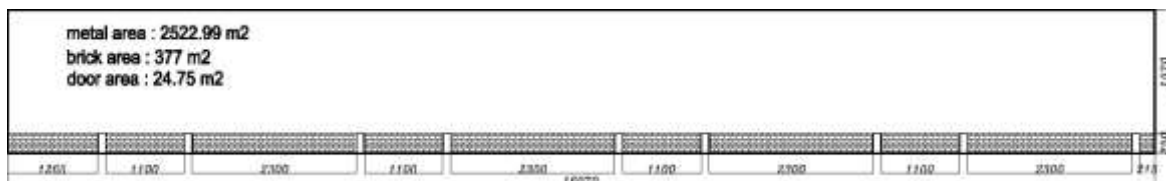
Indoor view of the front wall in turbine hall reverse plan of the power plant
